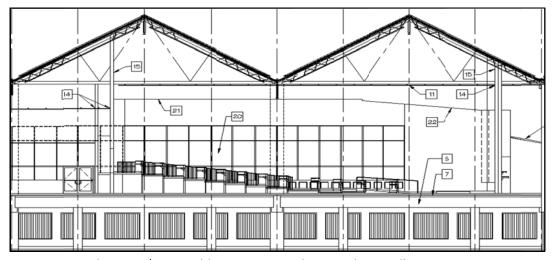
Auditorium | N-S Building Section Looking at Glass Wall
